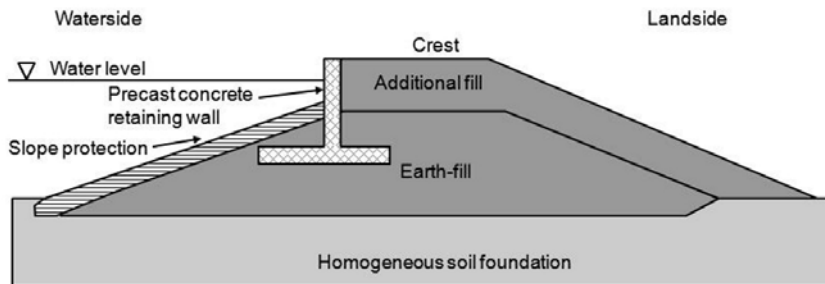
Levee crest raising with pre-cast concrete retaining wall
